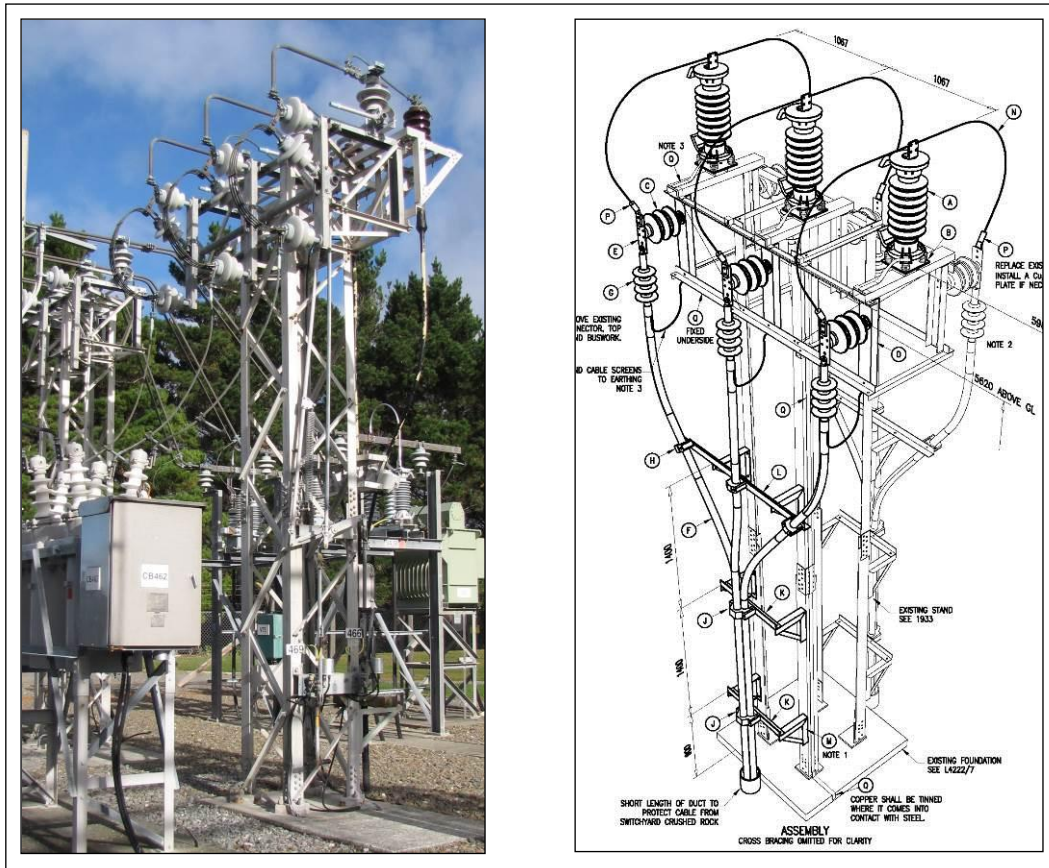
Feeder Cable Termination Stands – Existing (left) & Design (right)
